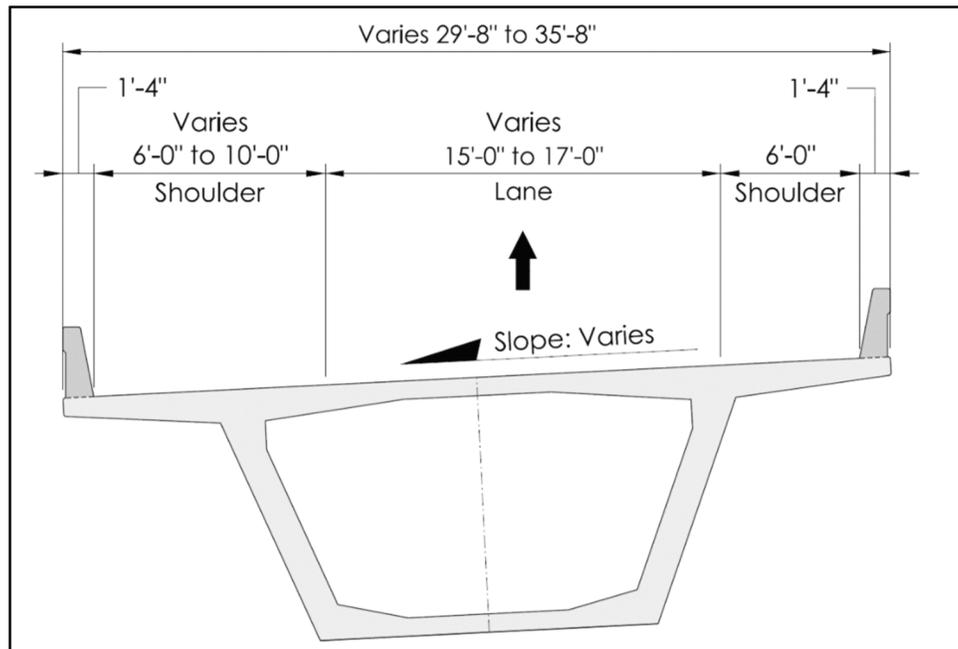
Proposed Bridge 5 Typical Section, Segmental Option
